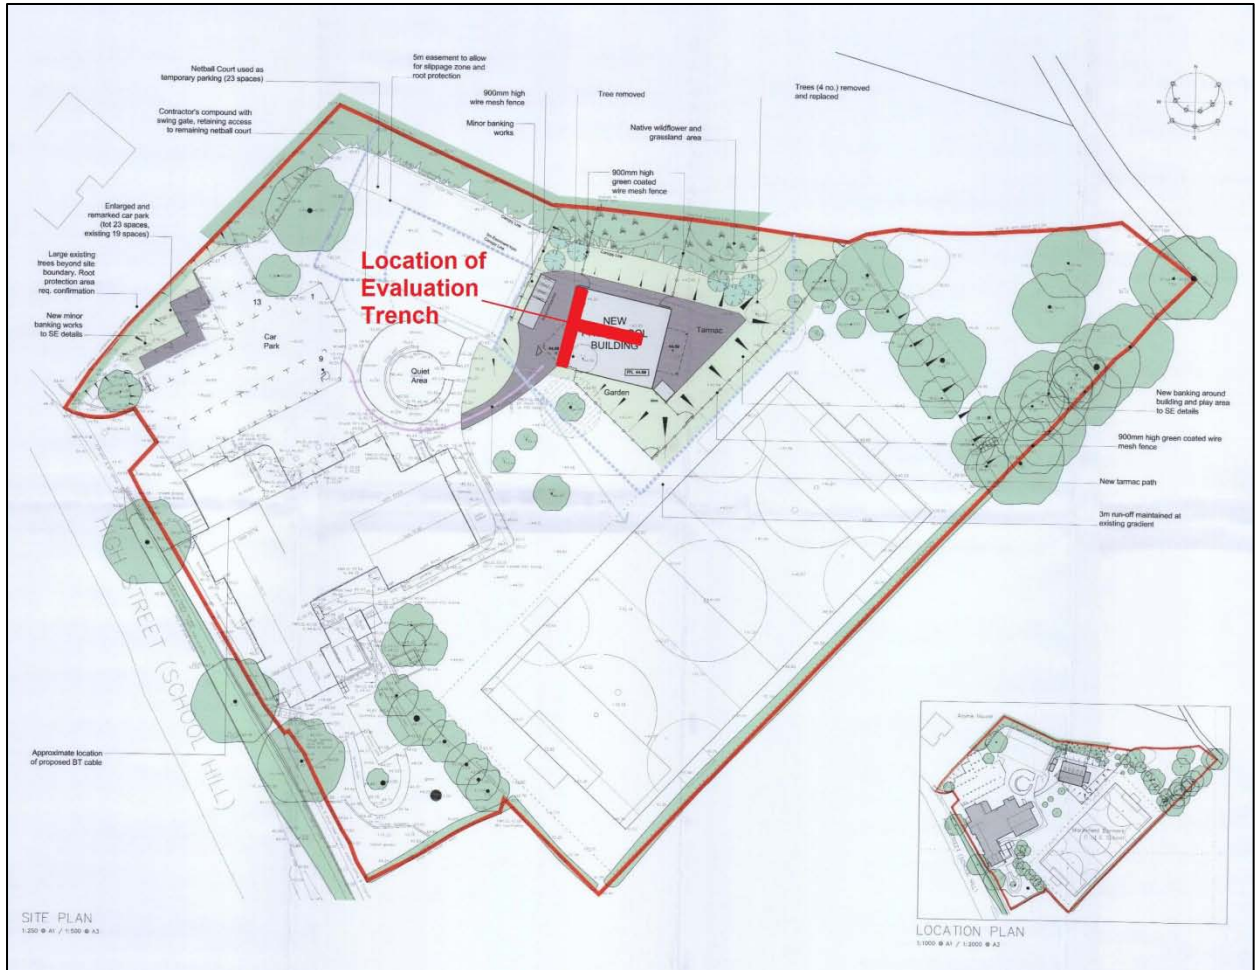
Bonners School, Maresfield: Site plan and location of the evaluation trench
